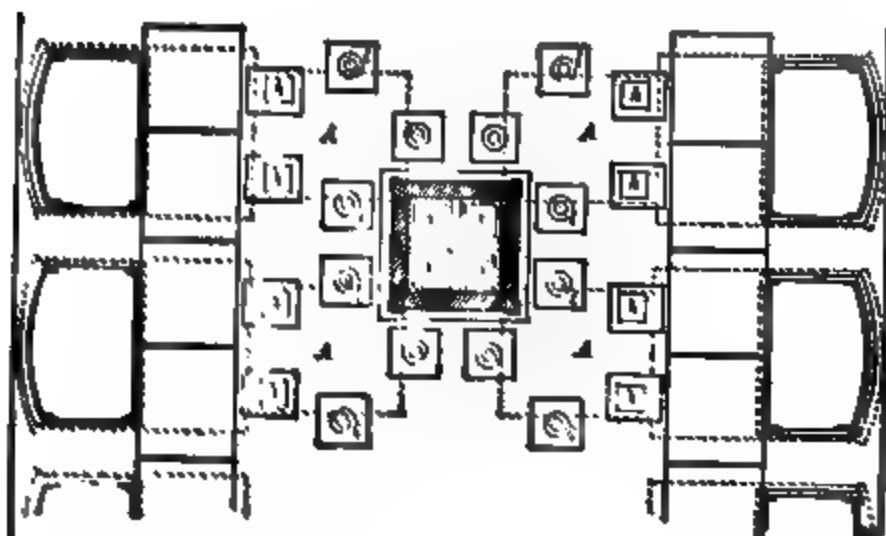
Plan at floor level of one block of Siemens Gas-producers.
